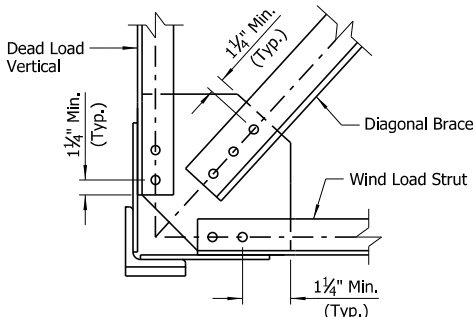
DETAILS OF SIGN SUPPORT CONNECTION TO TRUSS
